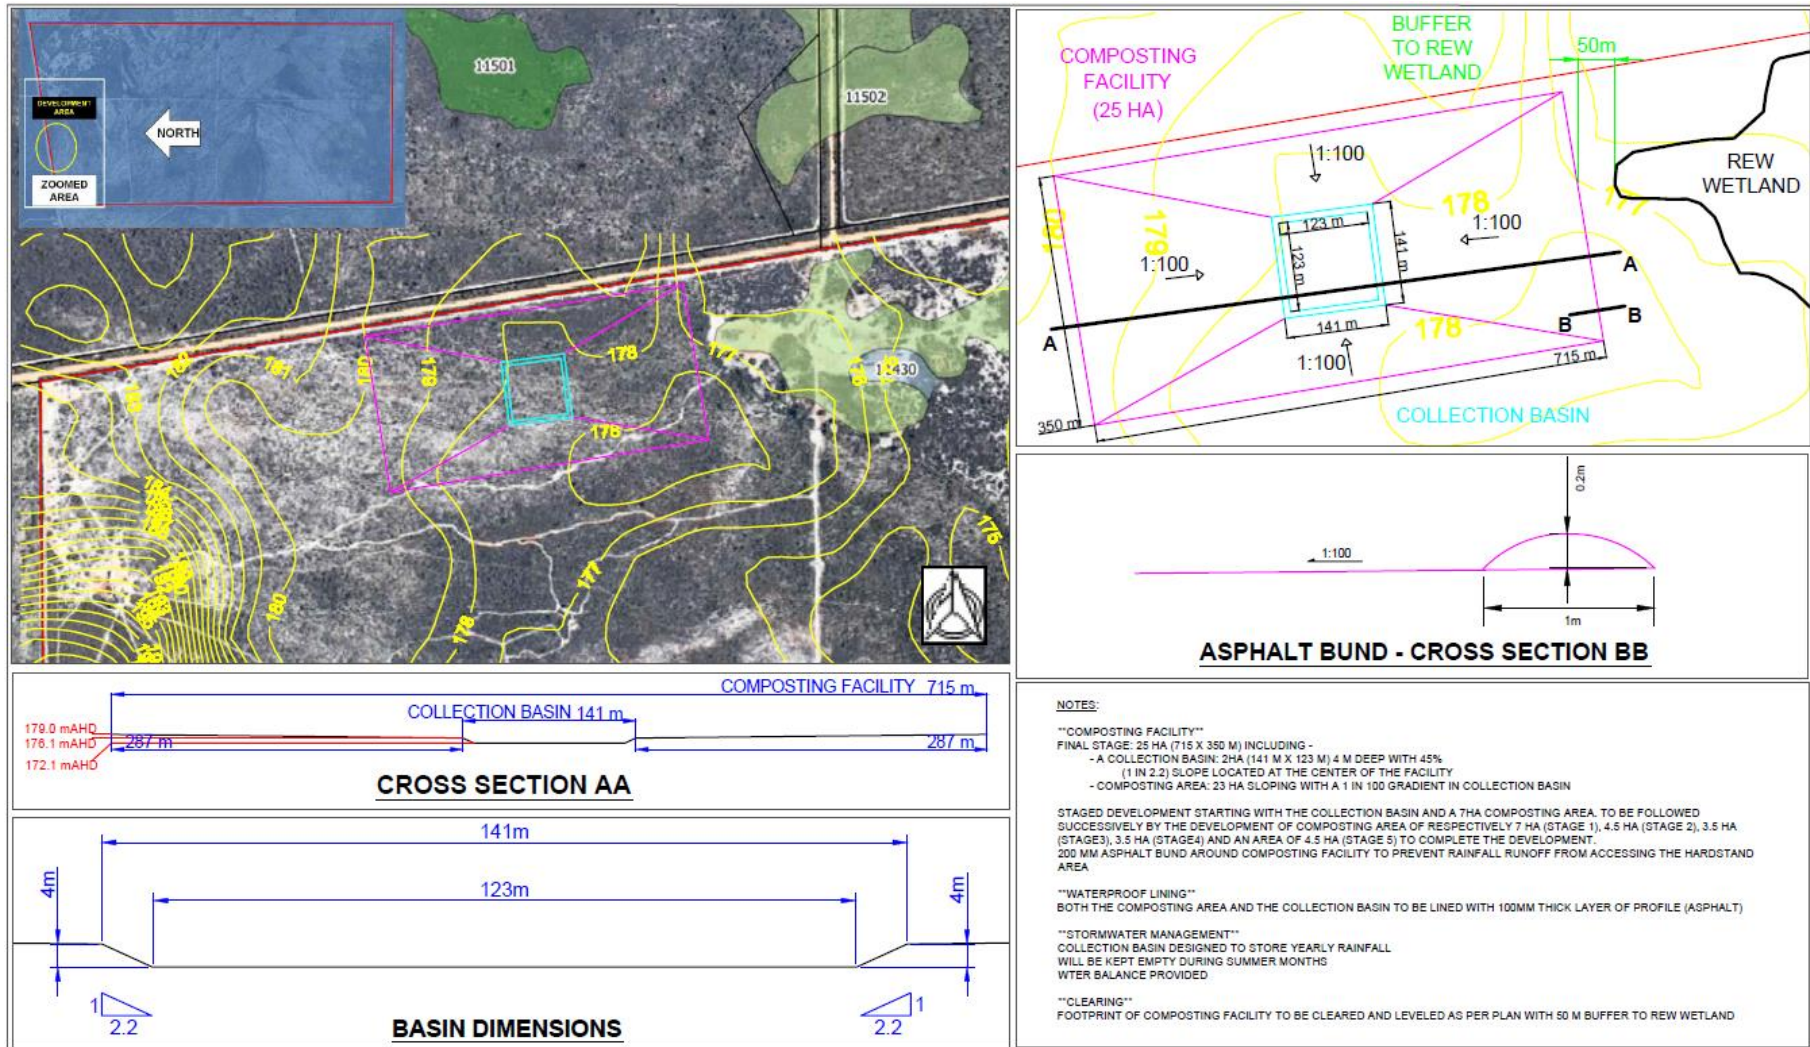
Cross section and dimensions of Composting Facility (Drawing submitted as part of the application)
